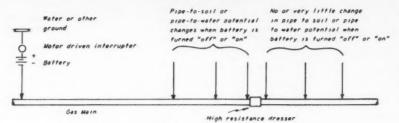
Locating open dresser couplings by pipe-to-soil method.
